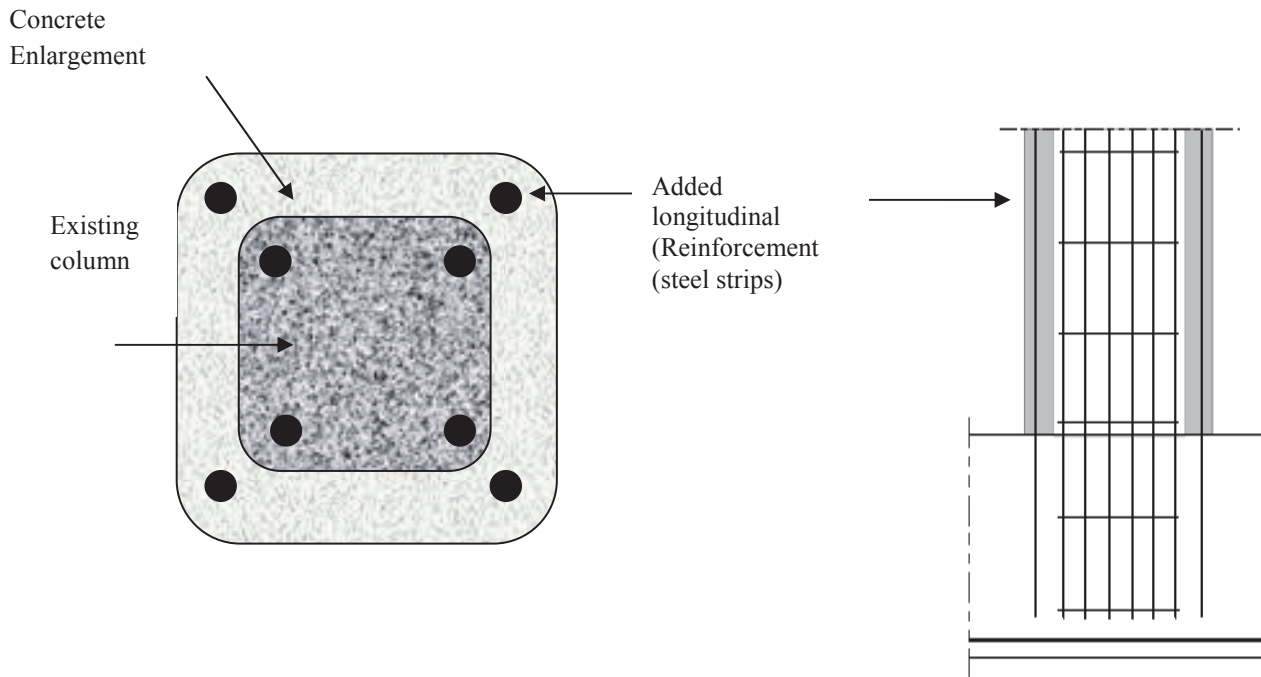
Increasing the cross-sectional area of column by RC jacketing
